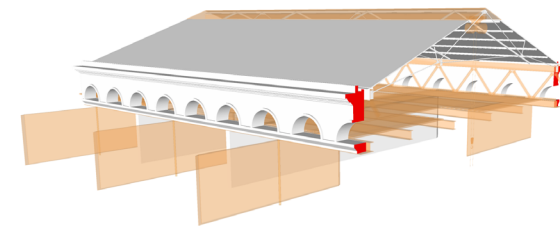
Insert pivoting doors, floor at top of interior walls, skylight
